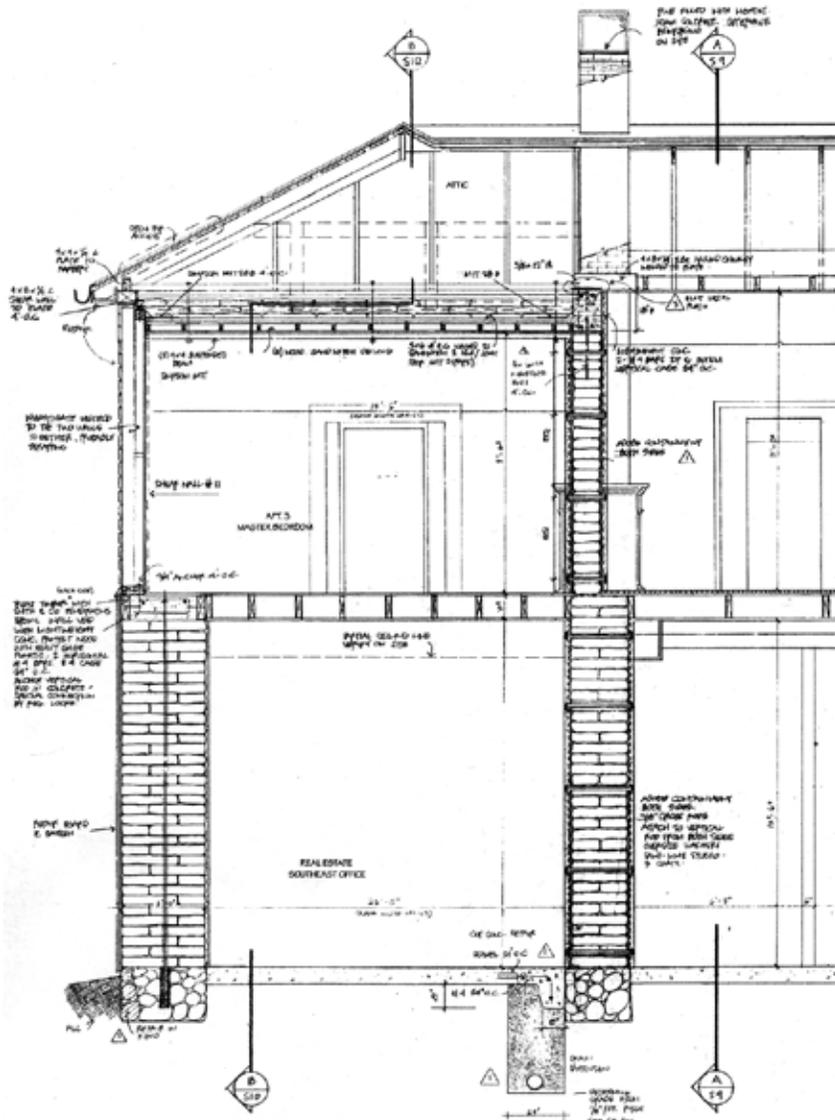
Salvador Vallejo Adobe wall and floor section, showing retrofit measures.
